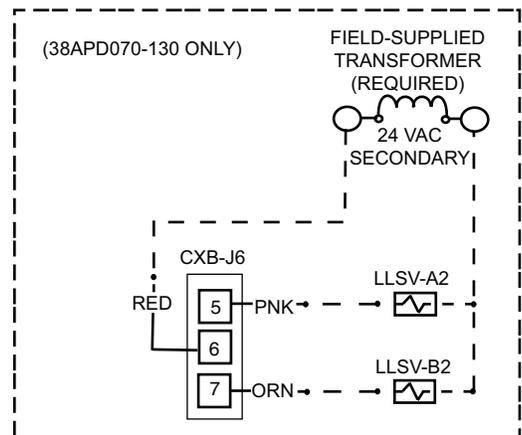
C.TYP=9 (VAV Setpoint) Wiring
